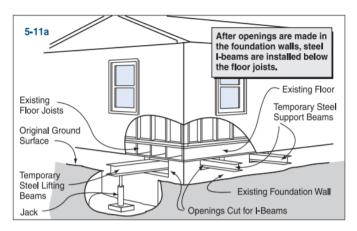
Cutting holes and inserting I-Beams in foundation walls.
